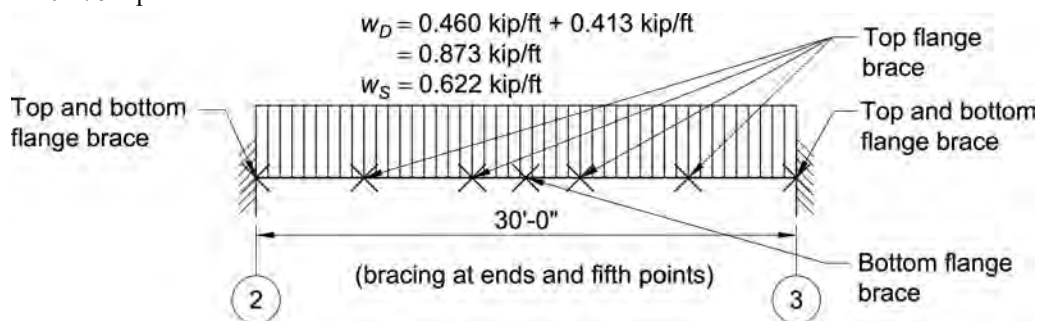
Loading and bracing diagram for roof beams at north and south ends of building.
